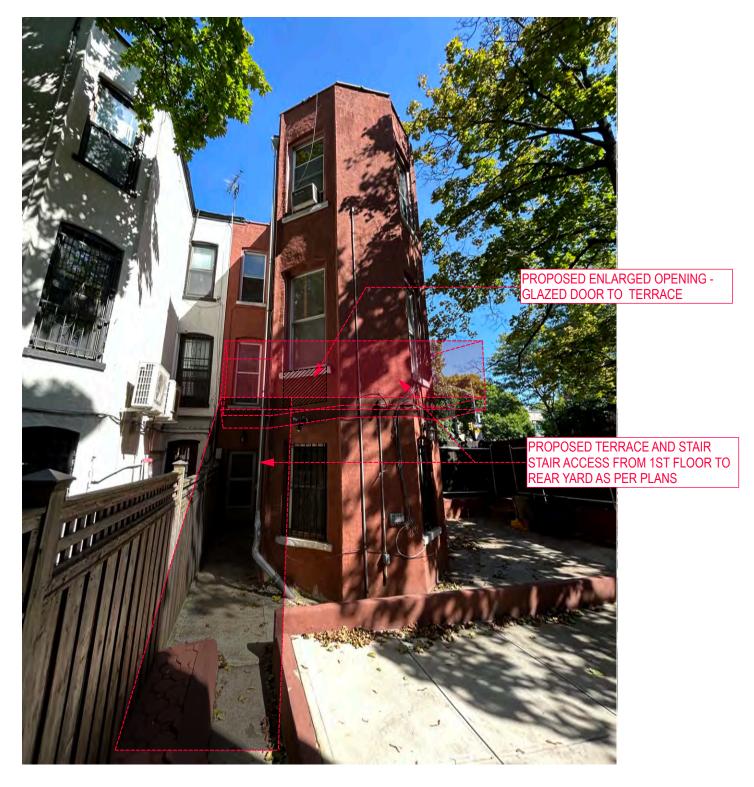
PHOTO OF REAR YARD ELEVATION WITH SKETCH OF PROPOSED WORK
